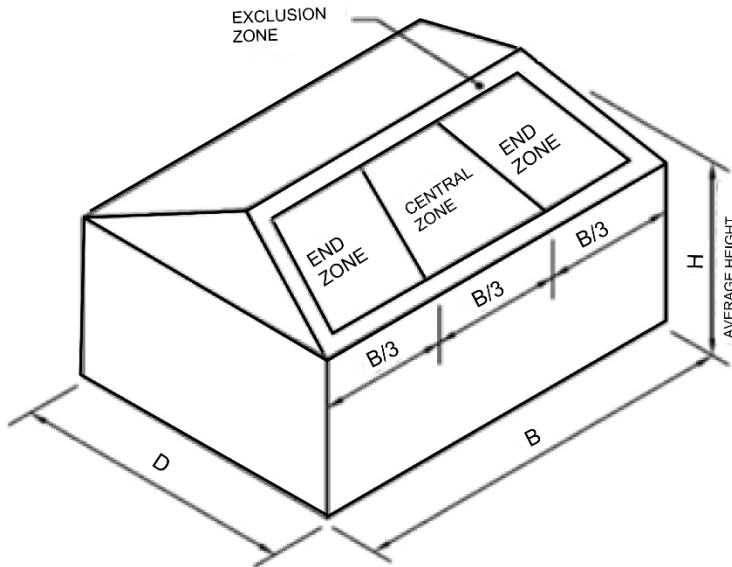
Figure B: Central & End Zones Plan/Elevation. AS1170.2
